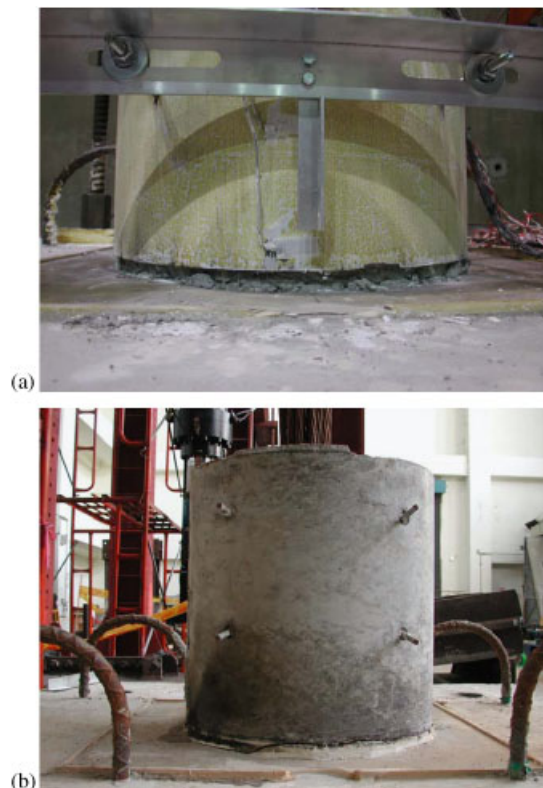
Concrete damage in the first segment (Specimen 1): (a) first test (6% drift) and (b) second test (after test).
